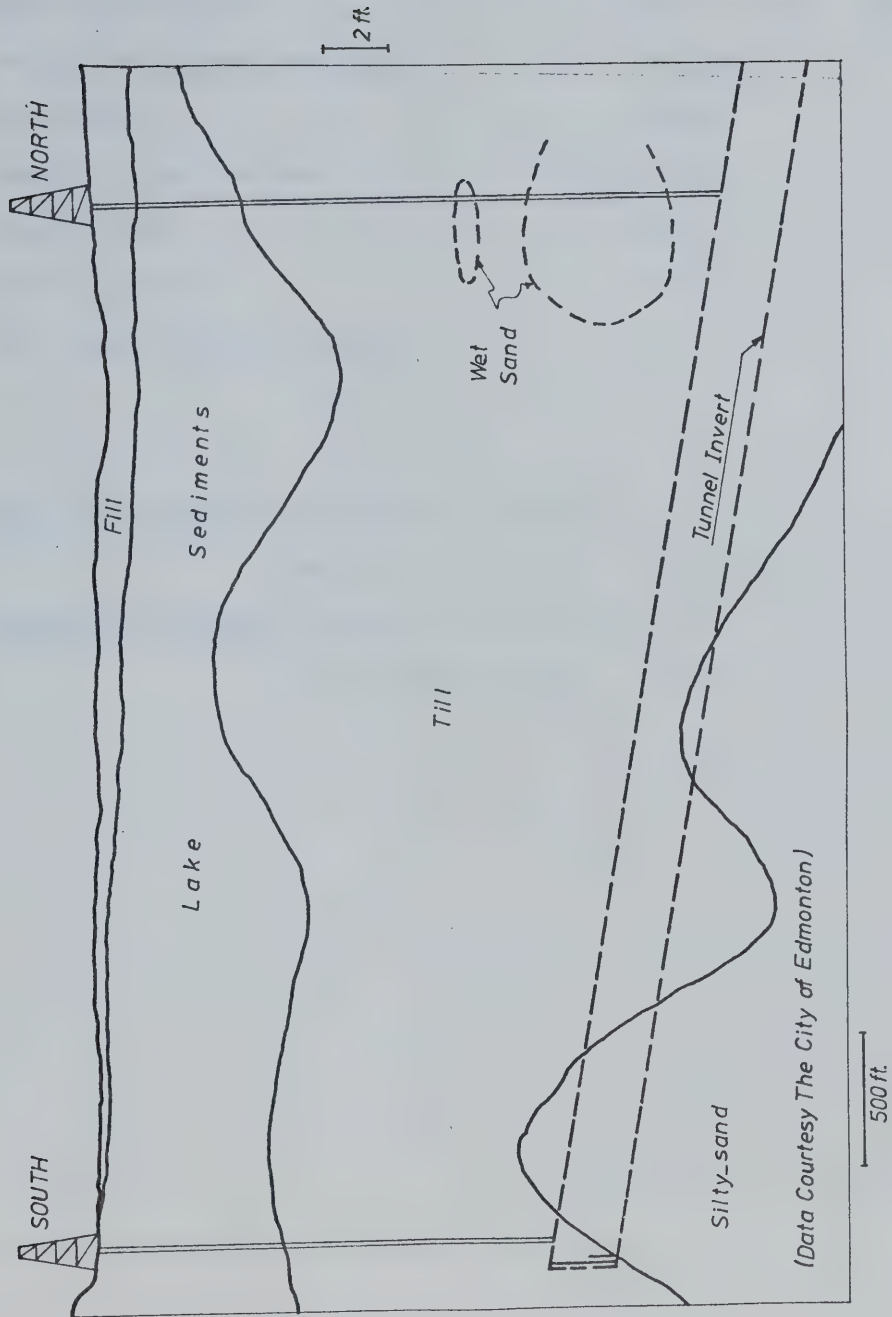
Soil Profile along the 170th Street Tunnel.
